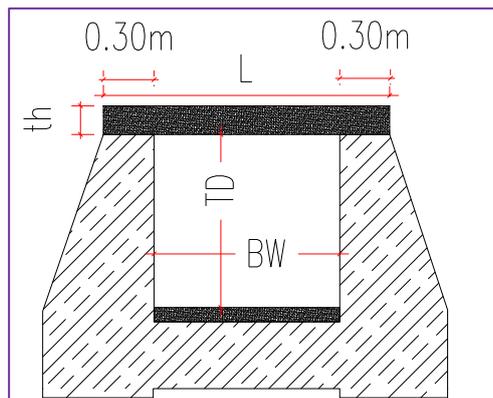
Typical Cross Section of the main canal at Foot Path Crossing
